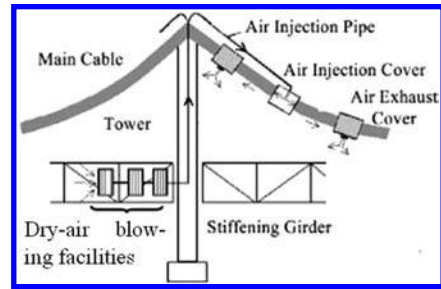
Dry-air injection system for Akashi Kaikyo Bridges.
